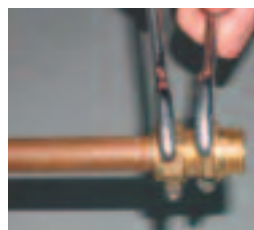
Cut the pipe perpendicularly to its axis using an appropriate tool and remove any possible flashes.
